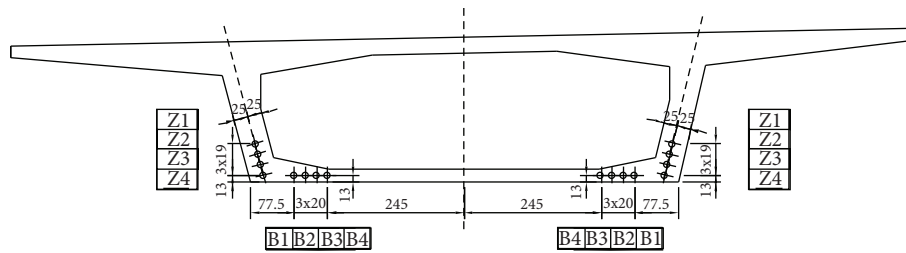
Prestress arrangement of the mid-span section (cm).
